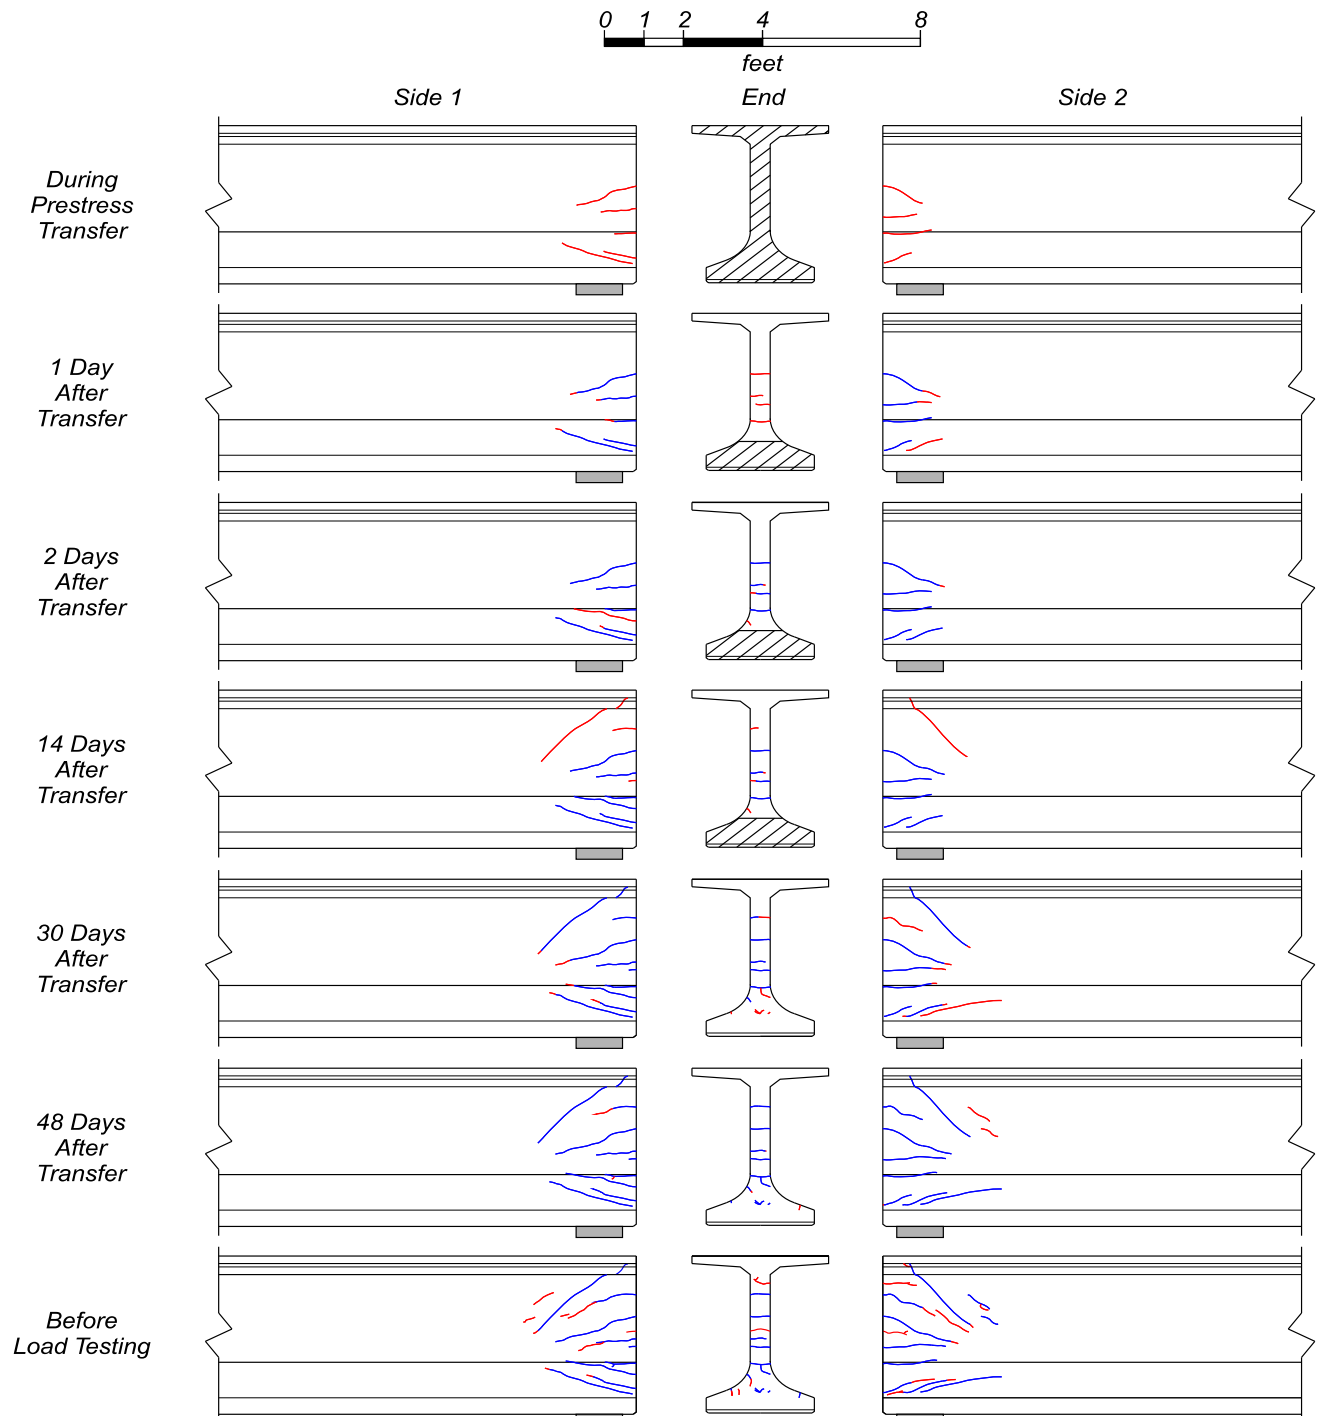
Crack growth in specimen LB (flexural cracks in top flange not shown)
